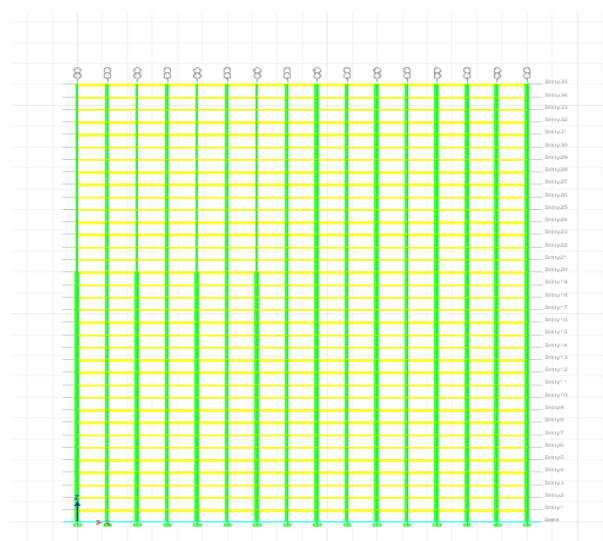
Showing elevation view of high rise building with out X Bracings
